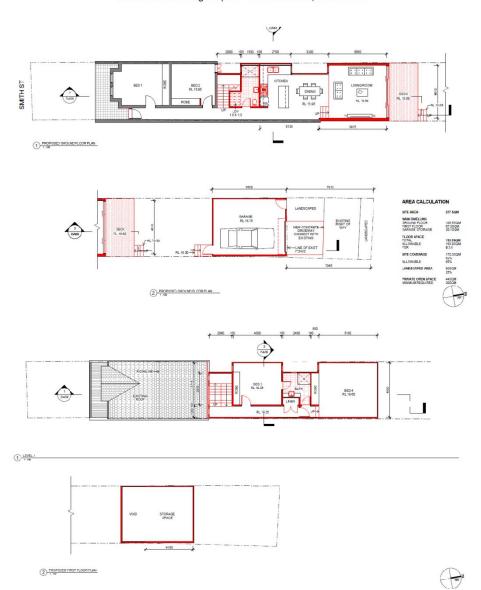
Proposed plans modified after pre-DA meeting with Council (see also Appendix B).
